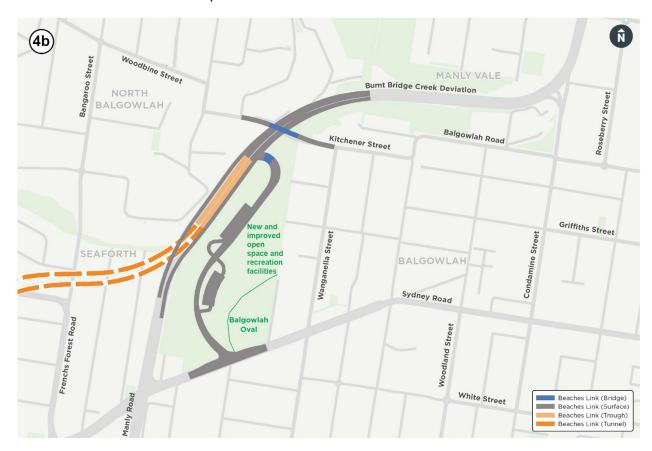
Alternative 4b – North facing tunnel ramps to Burnt Bridge Creek Deviation with access road aligned to the golf course's western boundary to distribute traffic and provide connection to the new and improved open space and recreation facilities
